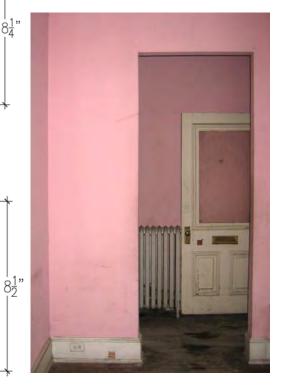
Door Opening D104. (Photo: BBB, 2006)
